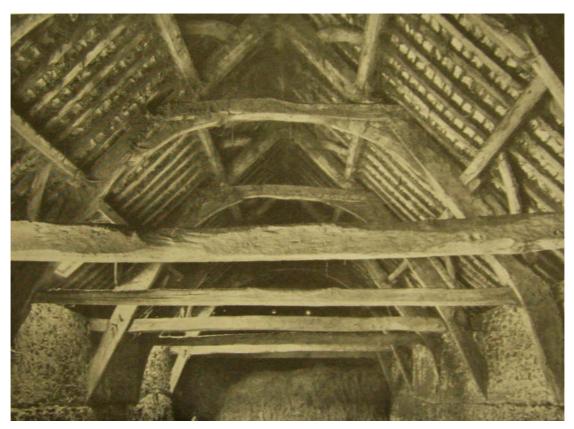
The roof structure of the barn at Park House Farm, Heversham (after RCHME 1936, plate 29)
